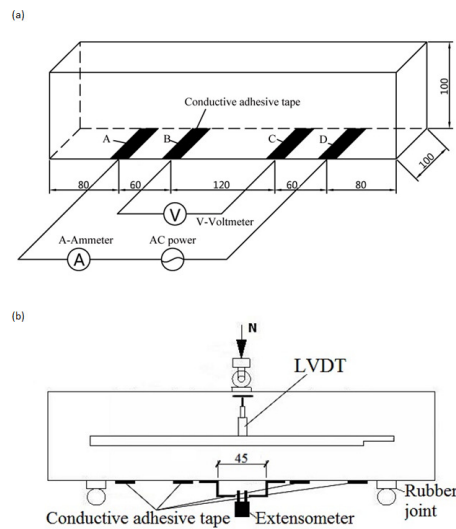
Measurement of FCR, deflection and COD of bending beam (a) Measurement of FCR; (b) Testing Set-up
